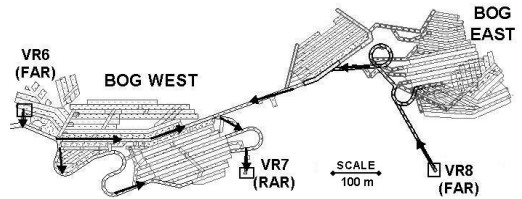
Revised Mine Design and Main Ventilation Plan for Bog Zone
